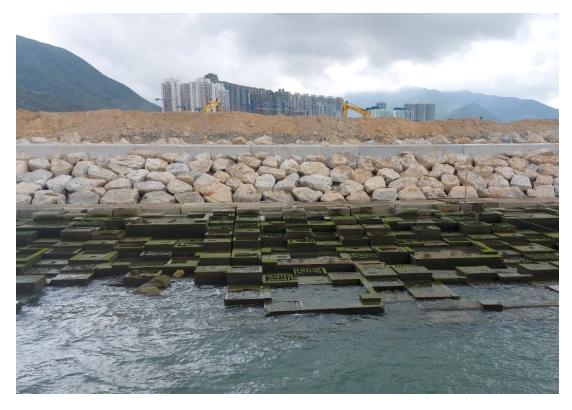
Natural Rock Material/Planting for Artificial Seawall
